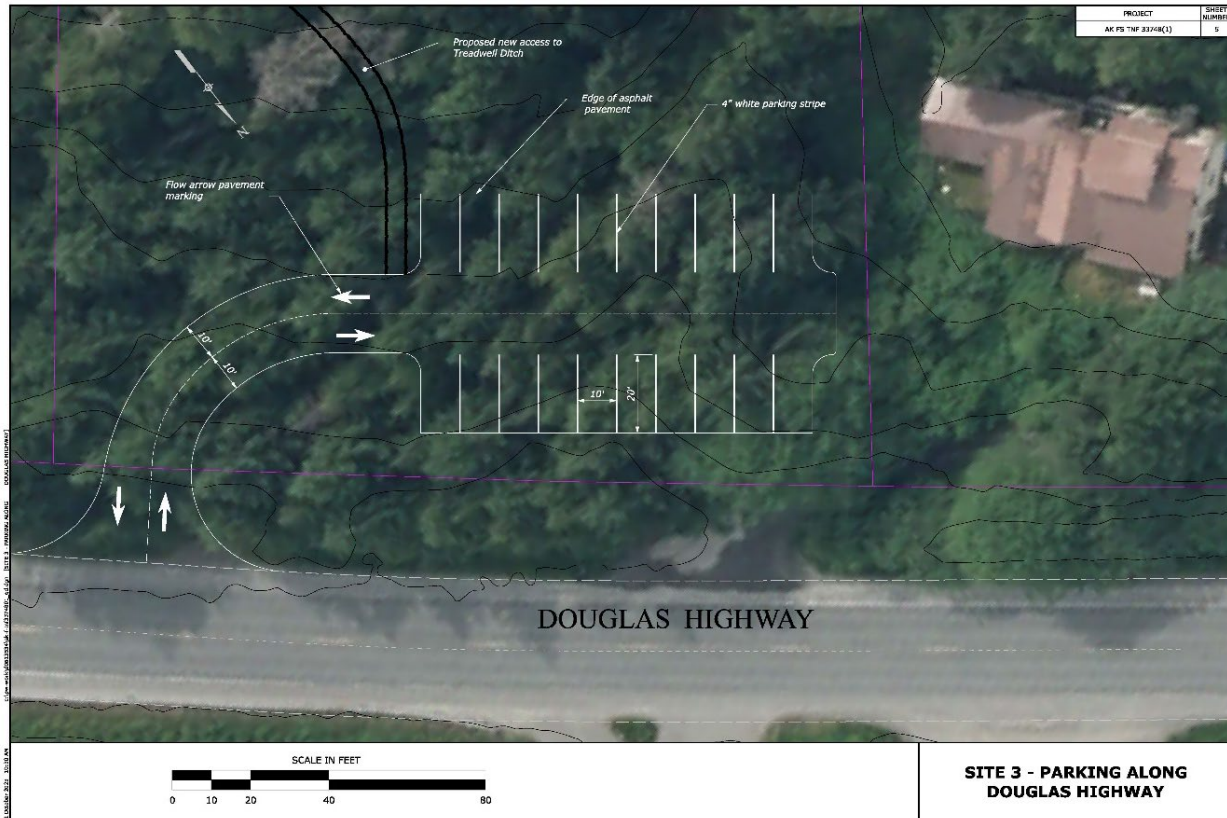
Initial Site 3 concept for parking adjacent to North Douglas Highway
